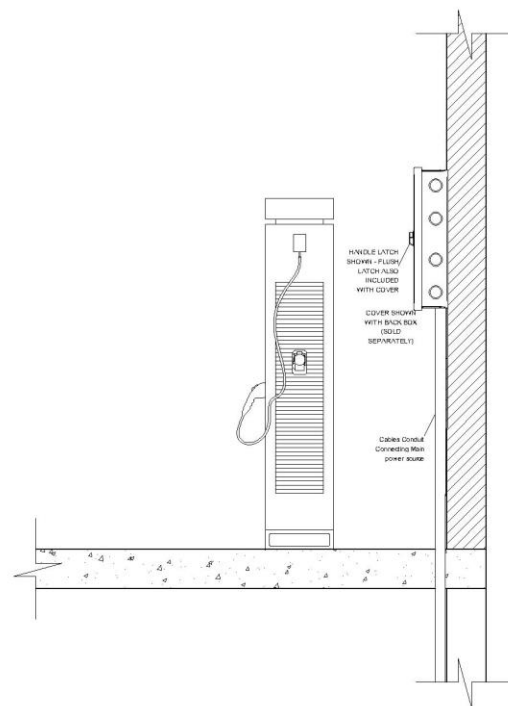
Sectional drawing of charger installation showing equipment mounting, conduit routing, and connection to electrical infrastructure.
